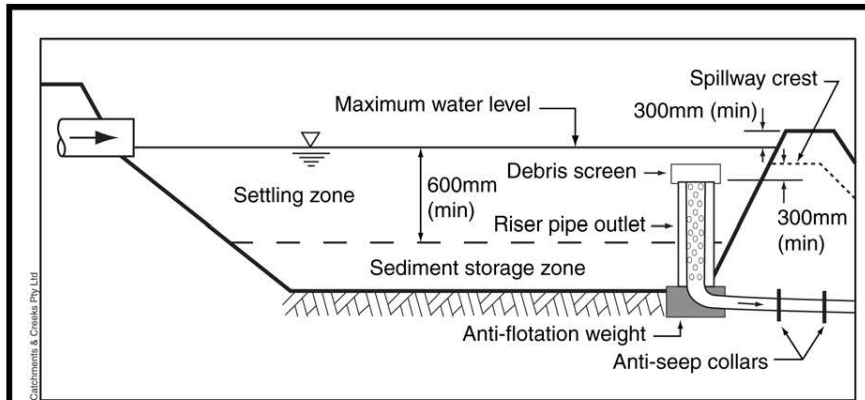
Type C Sediment Basin with riser pipe outlet (long section)
